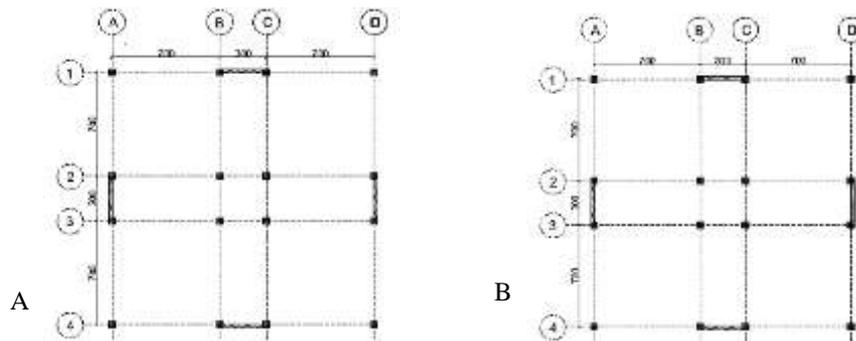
Plan of the models, A: MRF, B: MRF with shear walls
